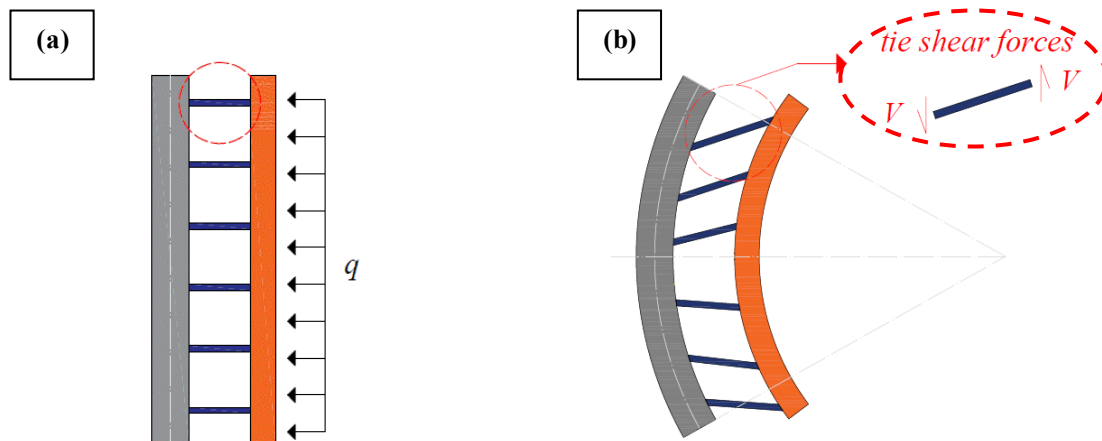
Internal stresses of a masonry tie in a cavity wall. (a) wall subjected to wind after deformation. (b) deformed shape due to wind pressure.
